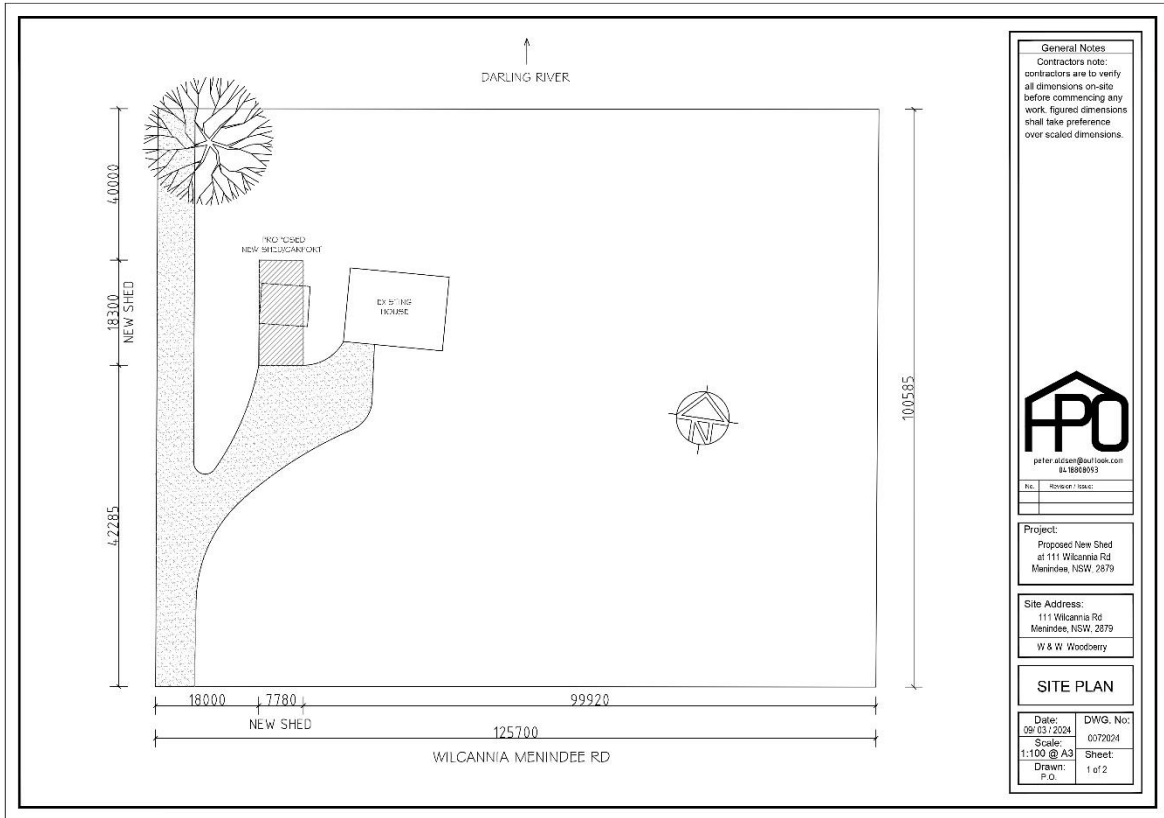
Site Plan Proposed Shed & Carport Lot 751 in DP 761876 Wilcannia Road Menindee
